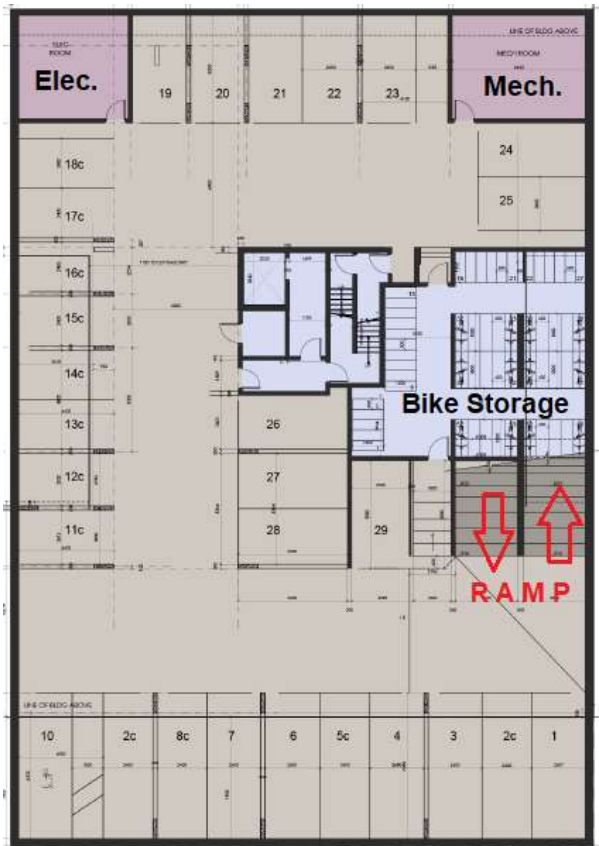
Exhibit Q: Proposed underground garage plan with red arrows marking the ramp
